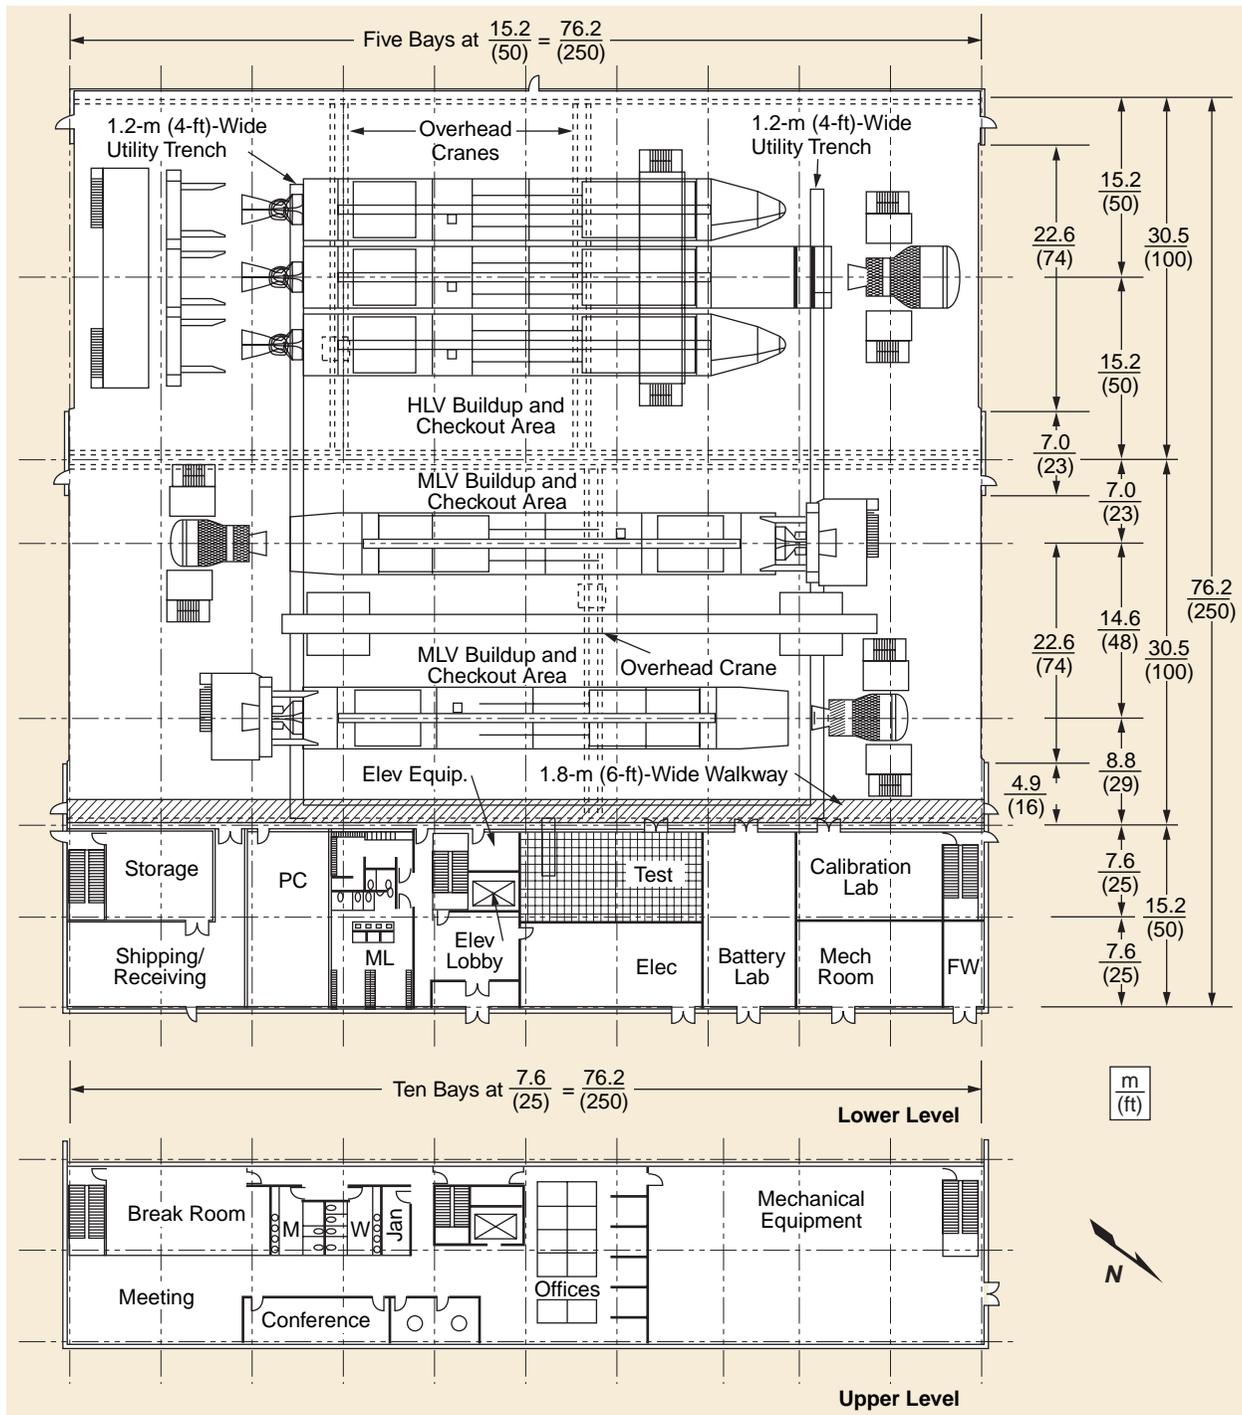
Space Launch Complex 37 Horizontal Integration Facility (HIF)
